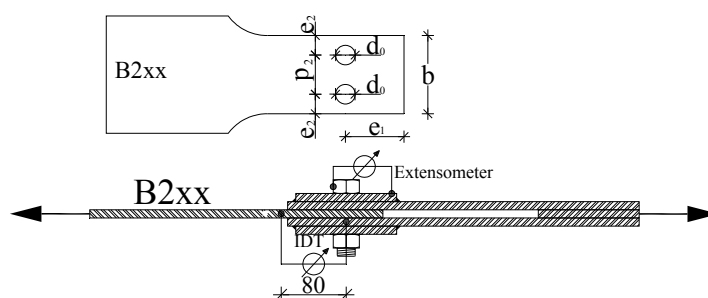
Specimen type B2 – two-bolt connection with bolts in double shear
